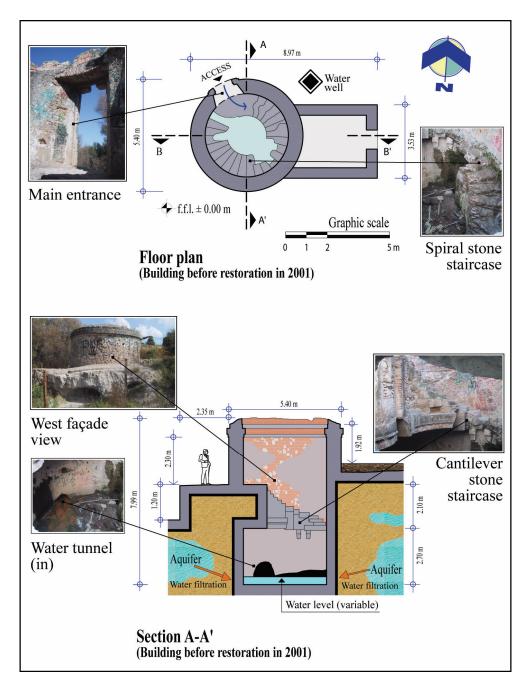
The Caracol water box. Floor plan and Section A-A'. (Source: Restoration project, photos and drawing by Alejandro Acosta Collazo originally in 2001. Drawing edition: Alejandro Acosta Colunga, August 2019.)
